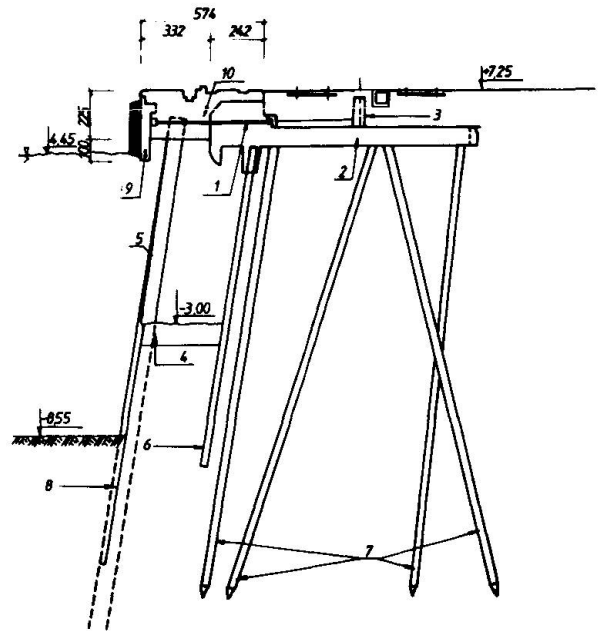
Cross-section of the strengthened berthing structure [4]: 1-prestressed anchor, 2-existing cover plate, 3-new crane-rail beam, 4-concrete, 5-H-piles, 6-existing BZ-sheet piling, 7-existing concrete piles, 8-Z-sheets, 9-prefabricated element, 10-new head beam.
